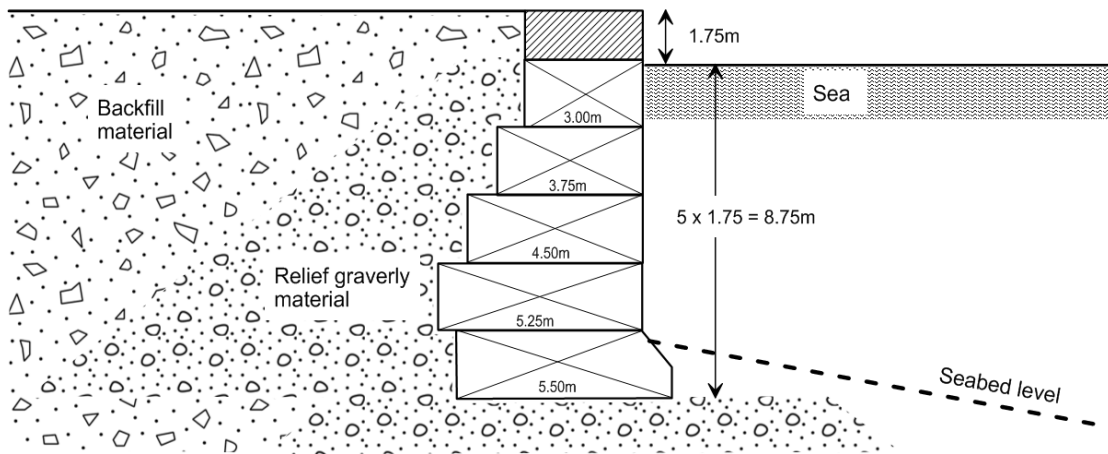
Typical cross-section of the quay wall of the new (Malagari) port of Vathy in section A - B of Figure 5.43. (Out-of-scale drawing, modified after Triton, 2017)
